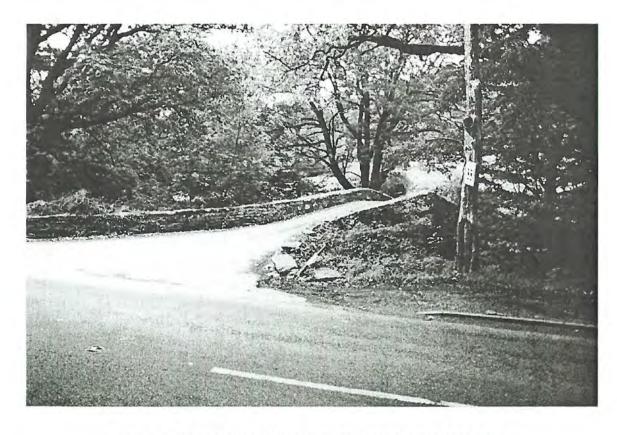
Site 99, Pont-ar-Lledr, general view showing wing walls
